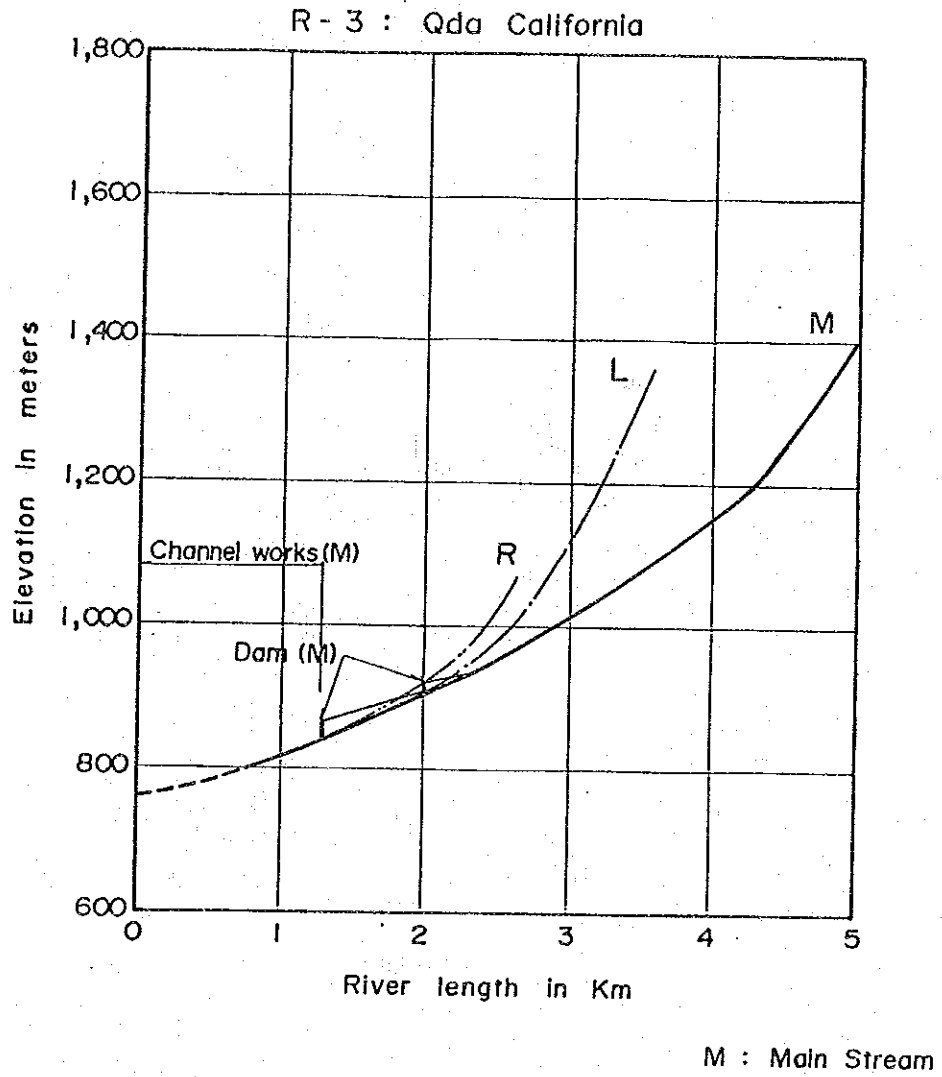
Structural Plan on Profile of Qda California (R3)
